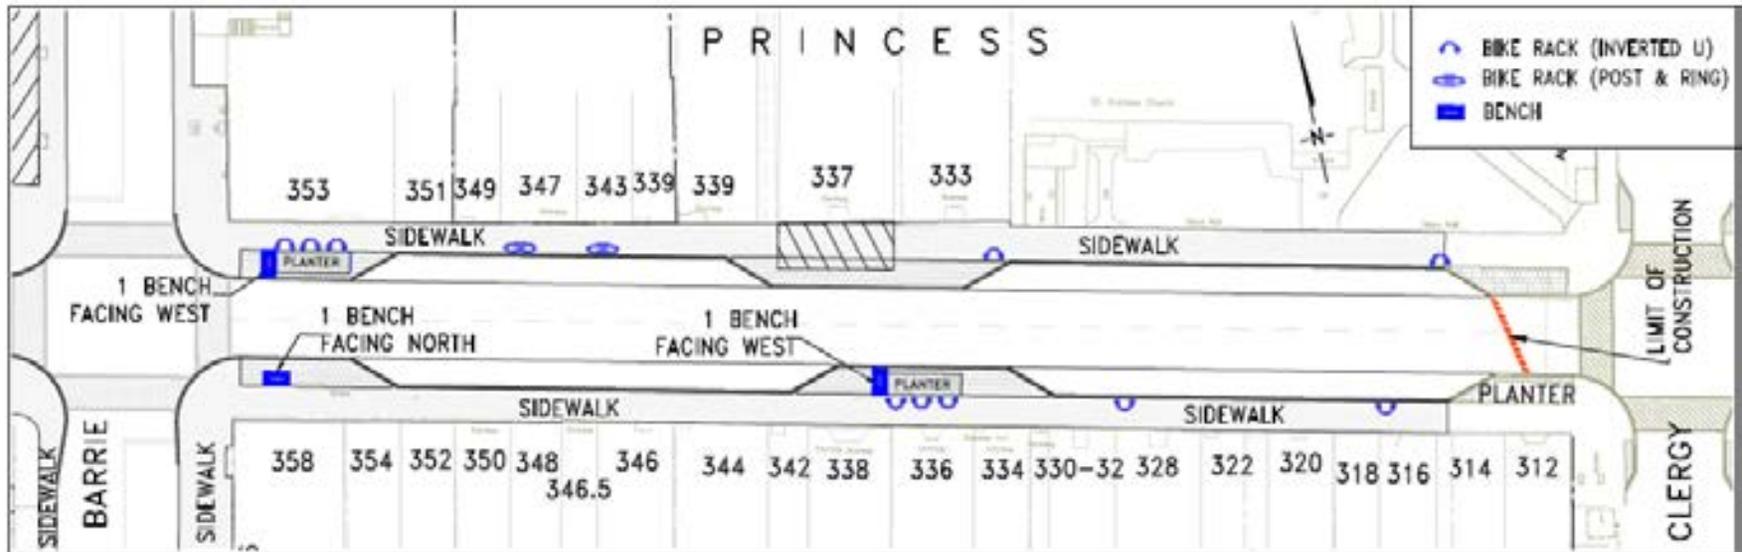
Bench and Bicycle Rack Placement on Princess Street from Barrie to Clergy Streets
